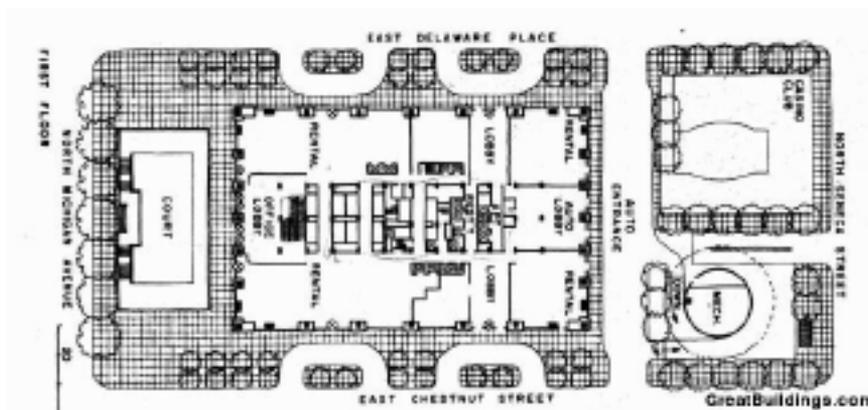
John Hancock Centre ground floor plan, SOM, 1969
